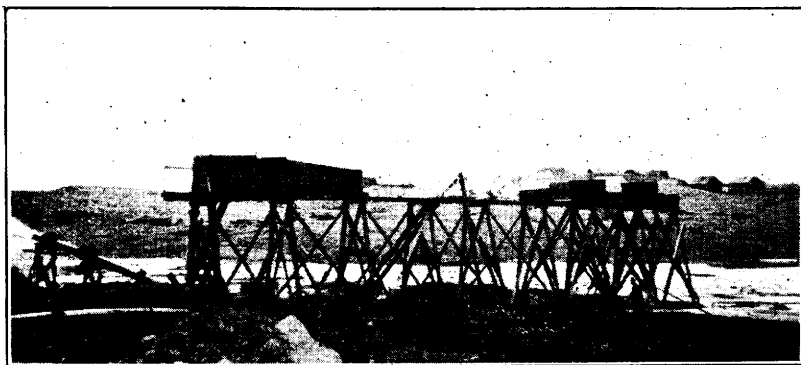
Installing hydraulic elevator and sluice boxes near Nome
